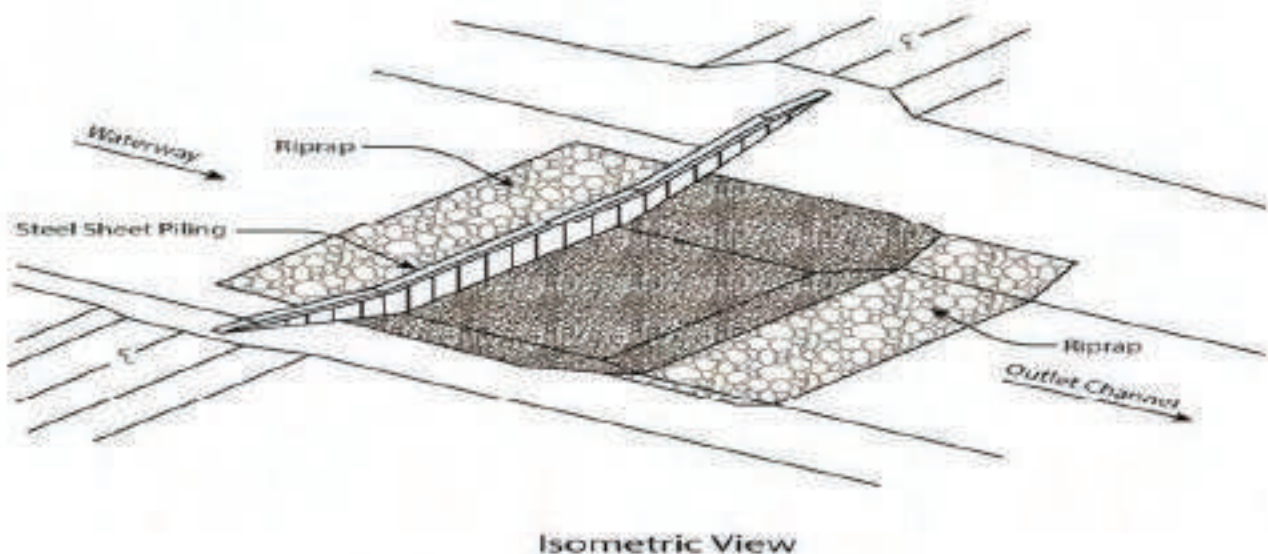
Isometric View of a Sheet Pile Check Dam
